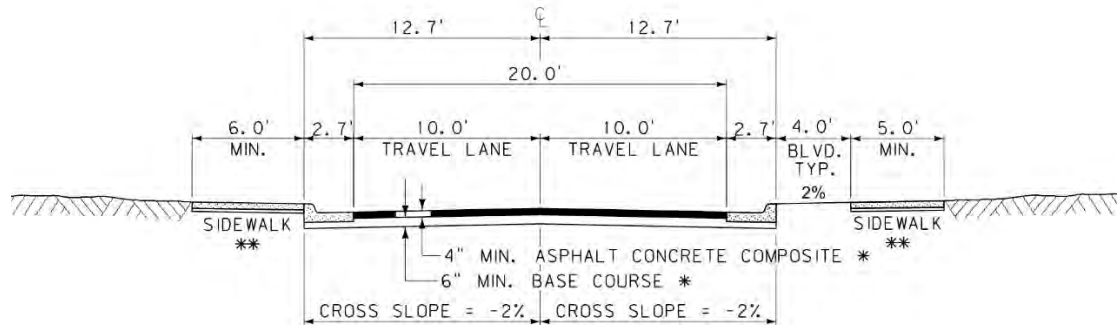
Standard Tribal Housing & Residential Street Typical Section - Rural
